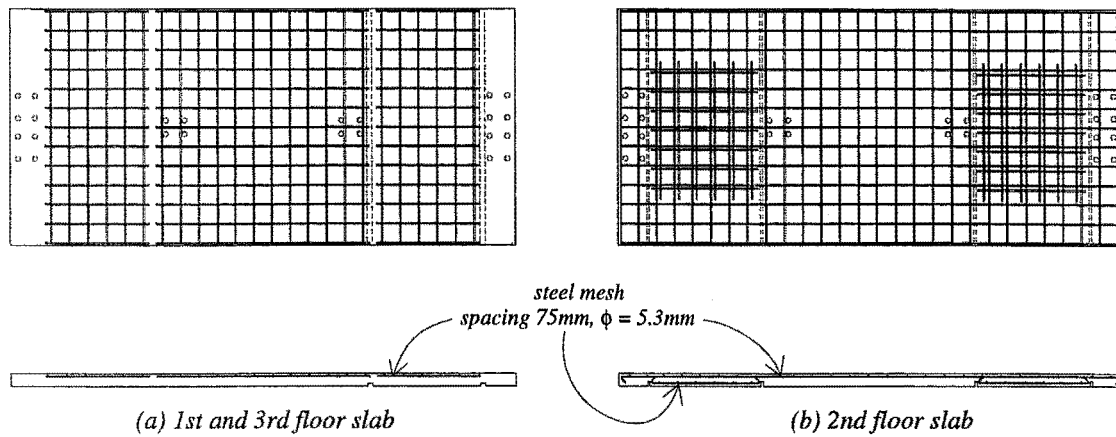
Plan and front view of slab showing reinforcing mesh
